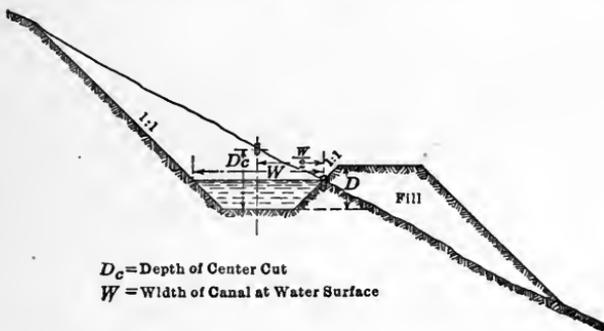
Location of Side-hill Canal with water cross section all in cut.
